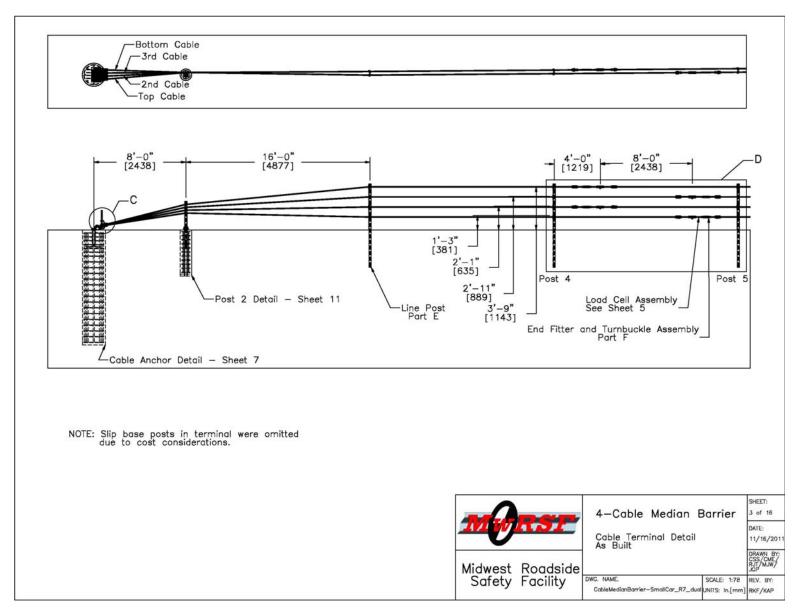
Cable Terminal Detail, Test No. 4CMB-2
